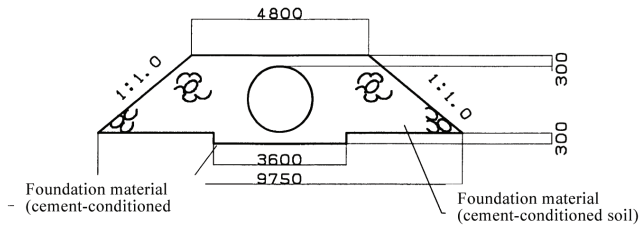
Cross-section of the covering backfill in which the geopipe was embedded (all the unit in mm).
